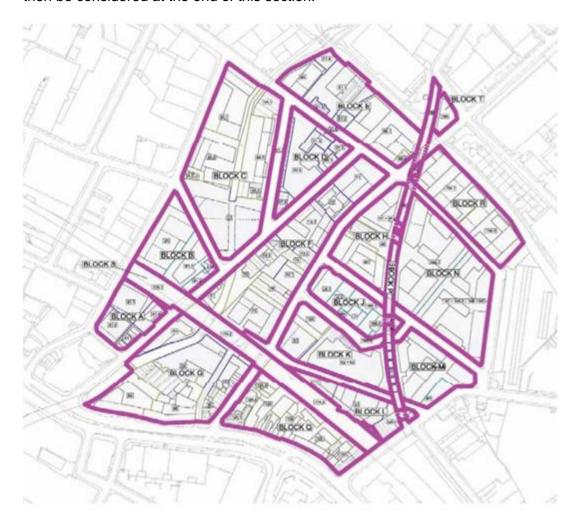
Extract from Financial Viability Assessment Proposed Block Plan
